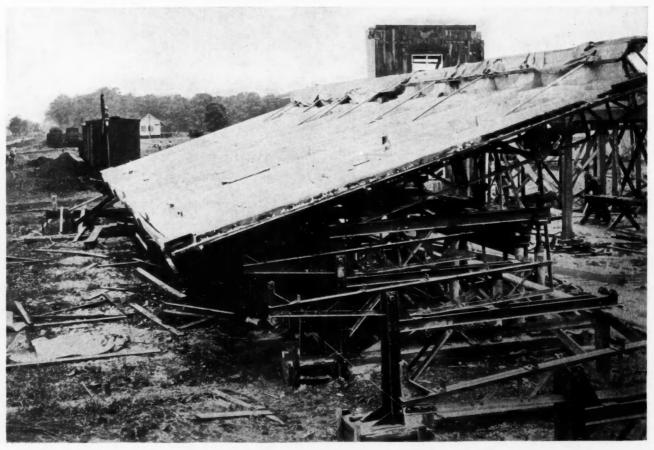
Finished Wall Section in Reclining Position, Showing Construction of Jacks
